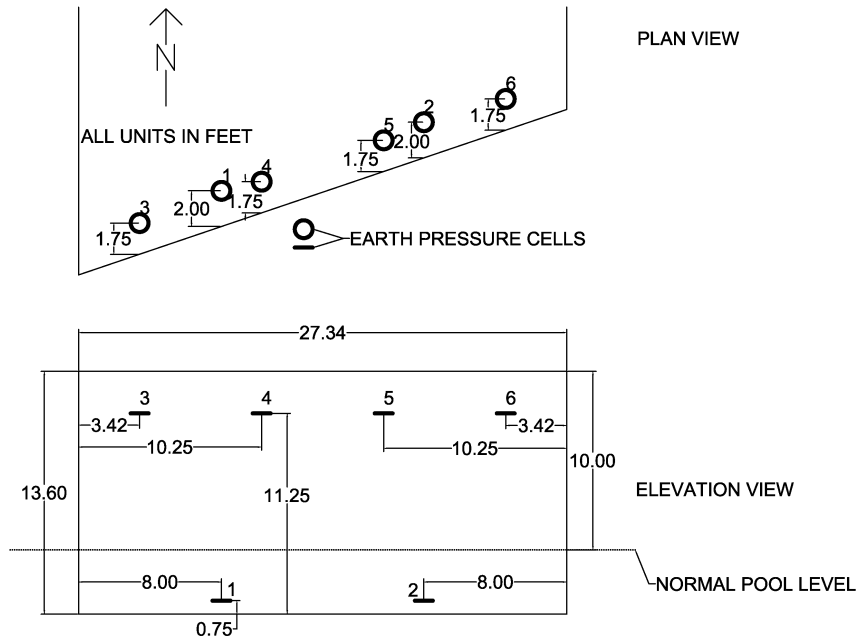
Earth pressure cell locations within north abutment of Rustic Road: plan view (top) and elevation view (bottom)
